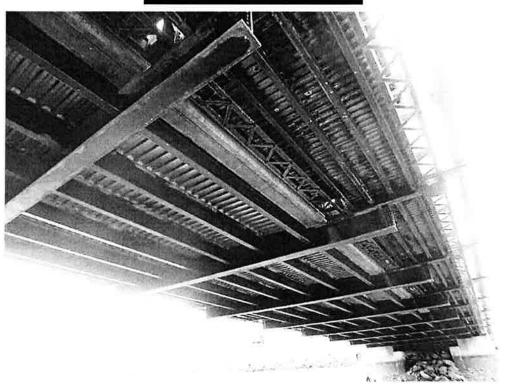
Underside of deck and superstructure, span 2 shown, looking west.
